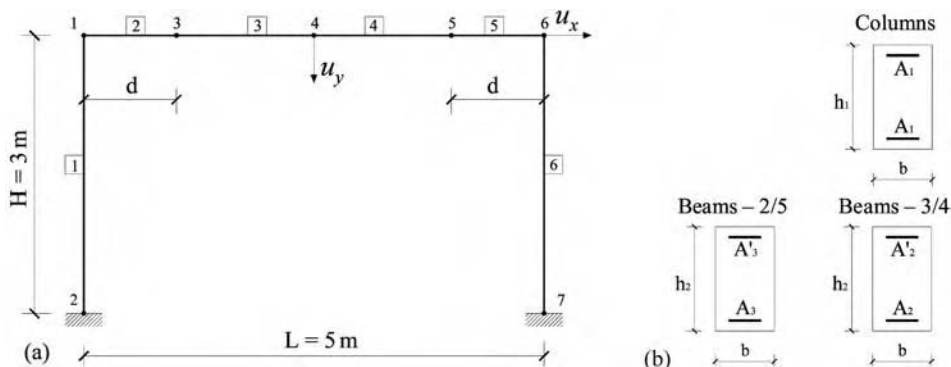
Reinforced concrete frame. (a) Geometrical dimensions and structural model. (b) Cross-sections of beam and columns.
